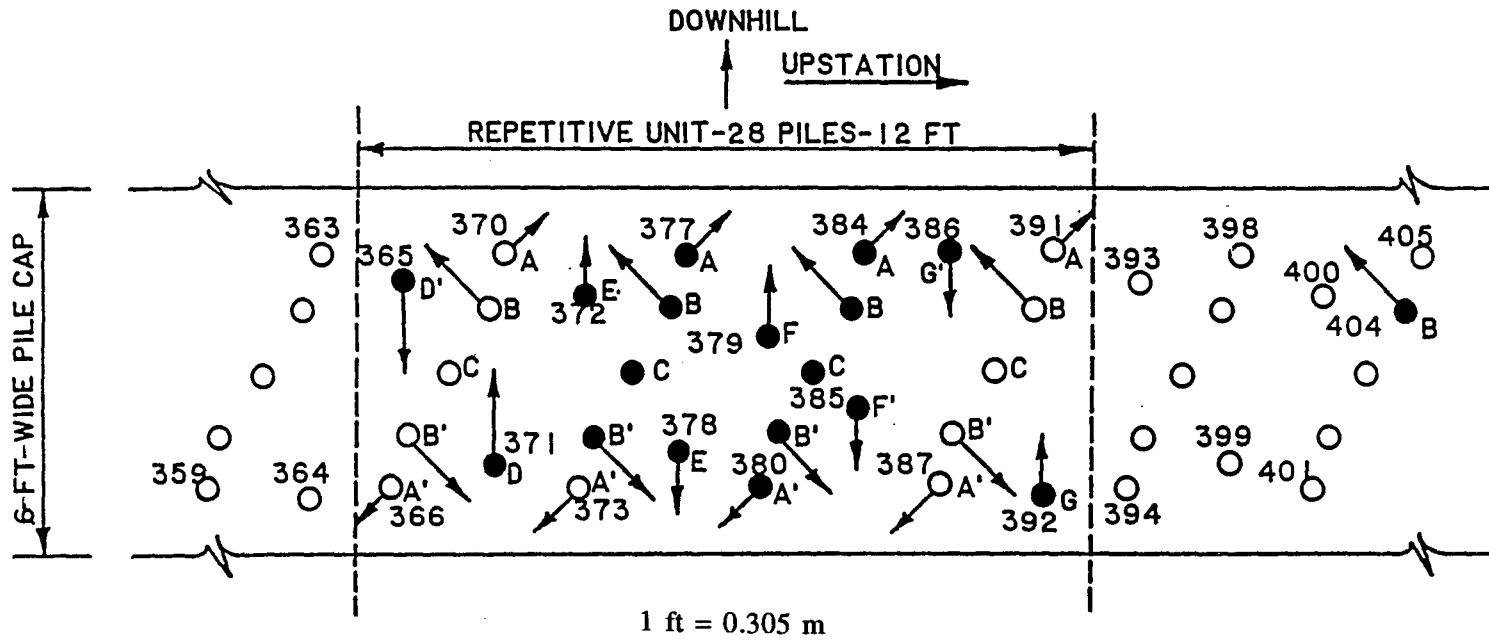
Plan view of instrumented section of wall, Mendocino, California (Palmerton, 1984).
